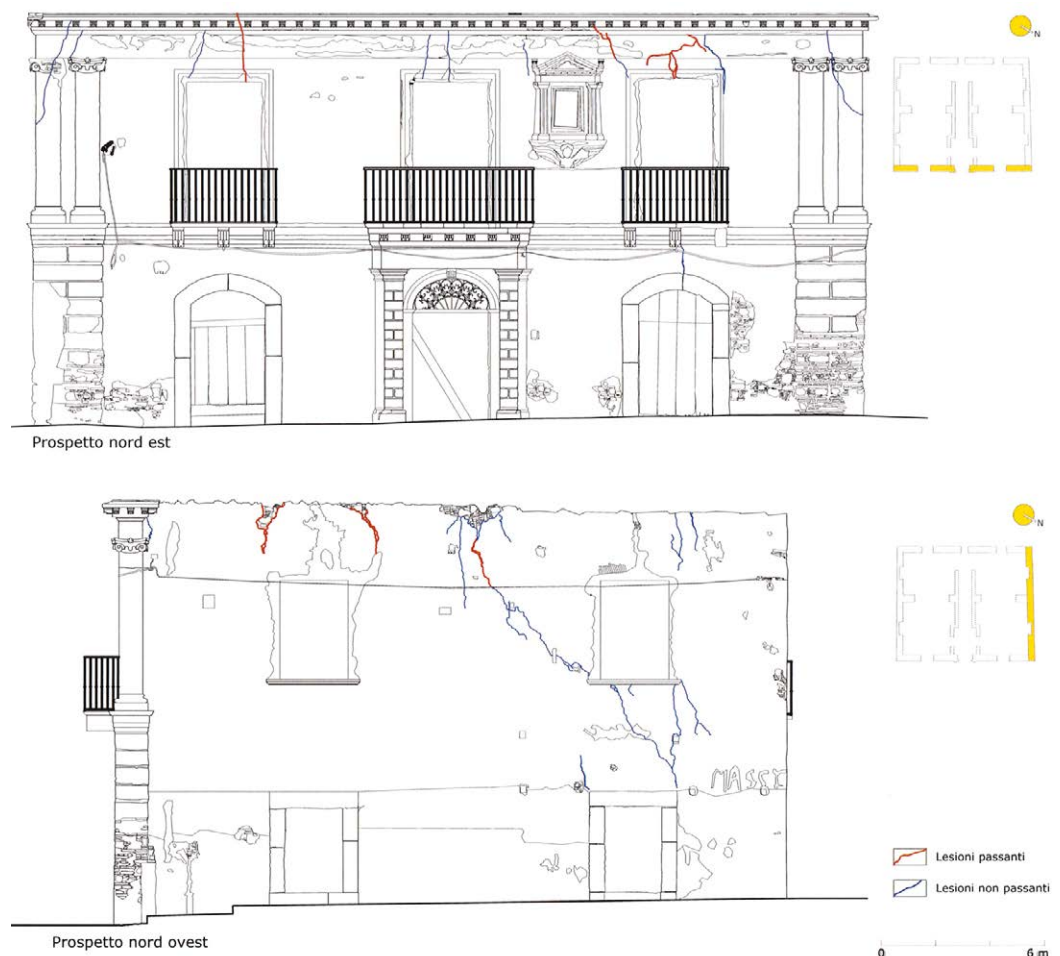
Portanova Palace, Reggio Calabria. Northeast and northwest elevations, crack framework [Valtieri 2016, p. 77].
